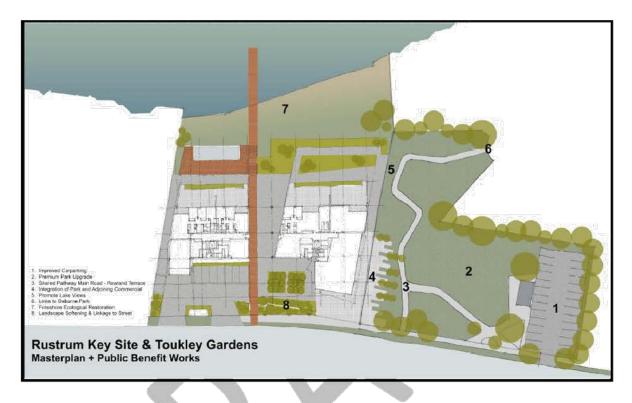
Preliminary landscape masterplan showing linkage of the development and the adjoining park and the creation of the Main Road to Rowland Terrace shared pathway link.
